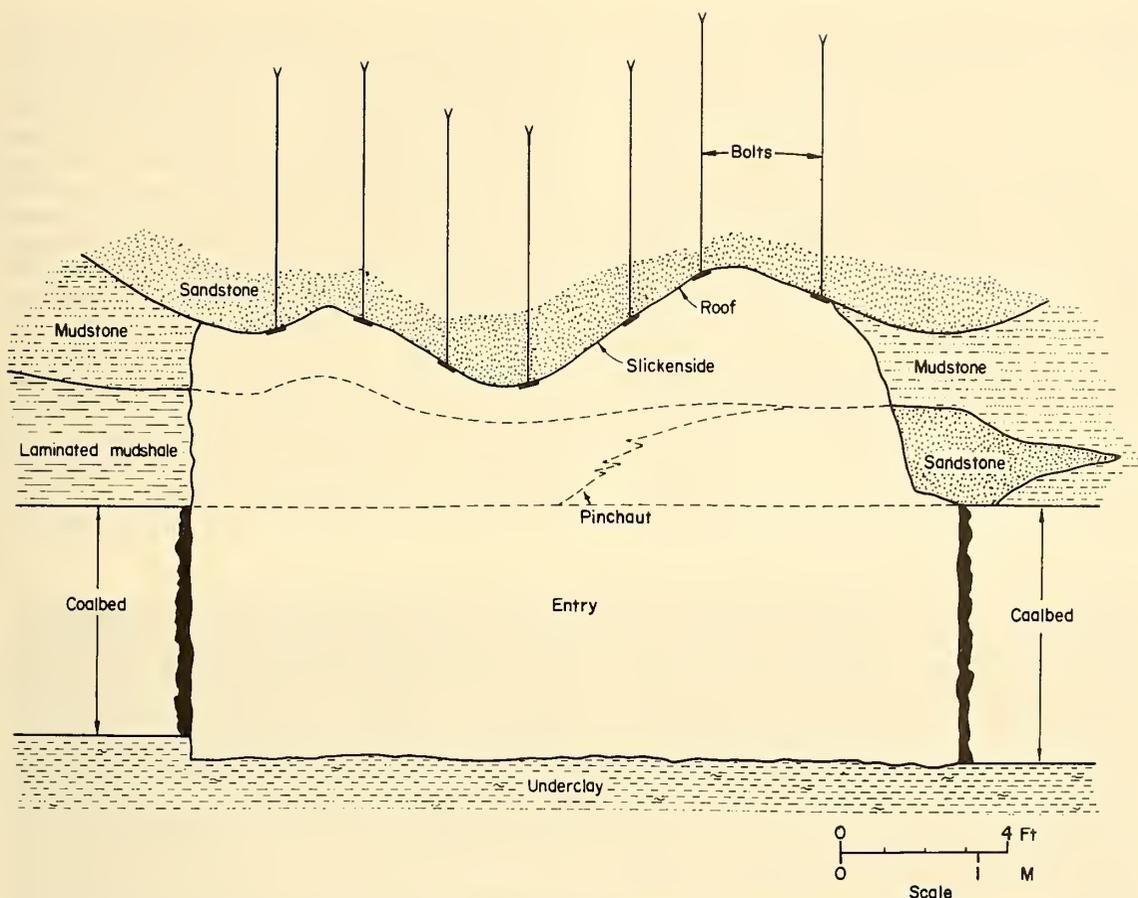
Abrupt termination of sandstone roof stratum. Dashed lines show roof structure when first exposed; original roof was at top of the coalbed.
